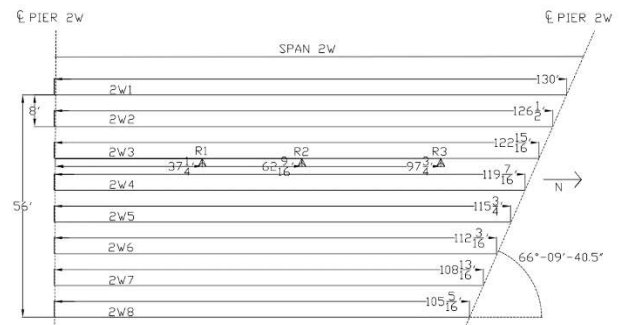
Framing Plan of Span 2 indicating Aluminum Corner Reflector Locations R1-3 and Drexel Potentiometers SB2-3-1, SBS-3-2 and SB2-3-3, respectively
